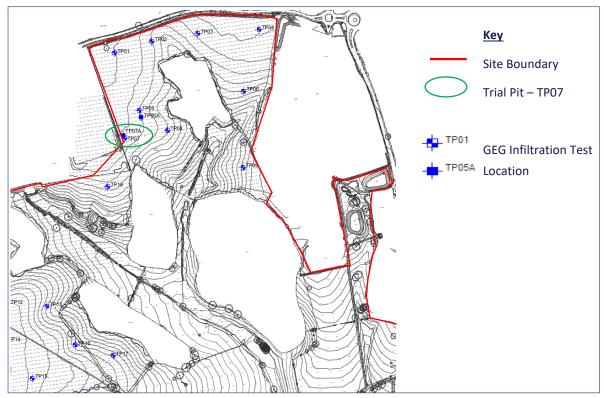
GEG Infiltration Trial Pit Location Plan extract (Report GEG-14-352)
